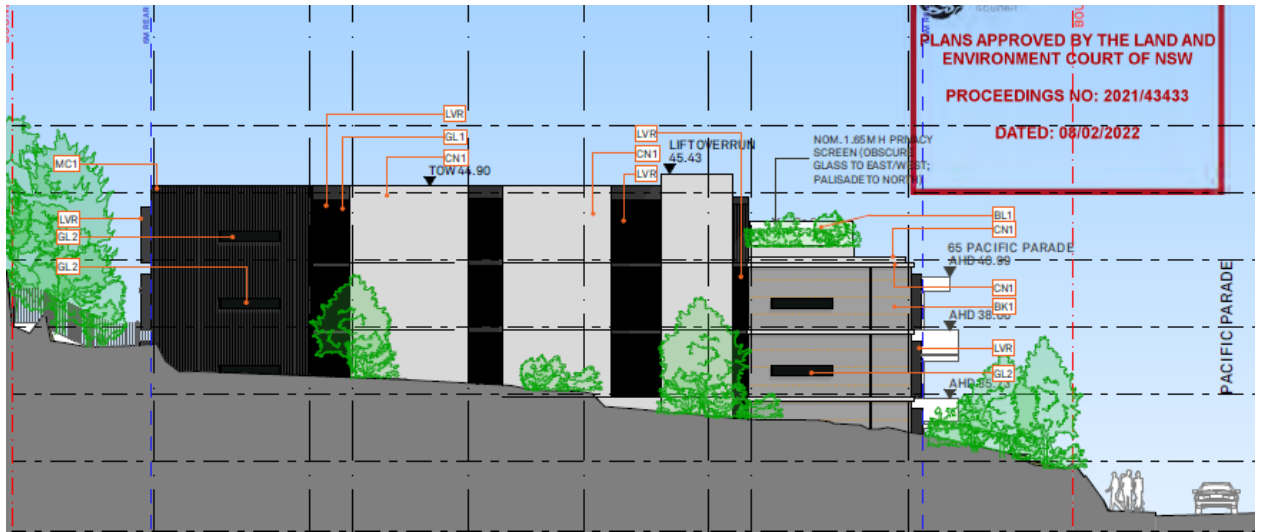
Approved Eastern (side) elevation under DA2020/1597.
